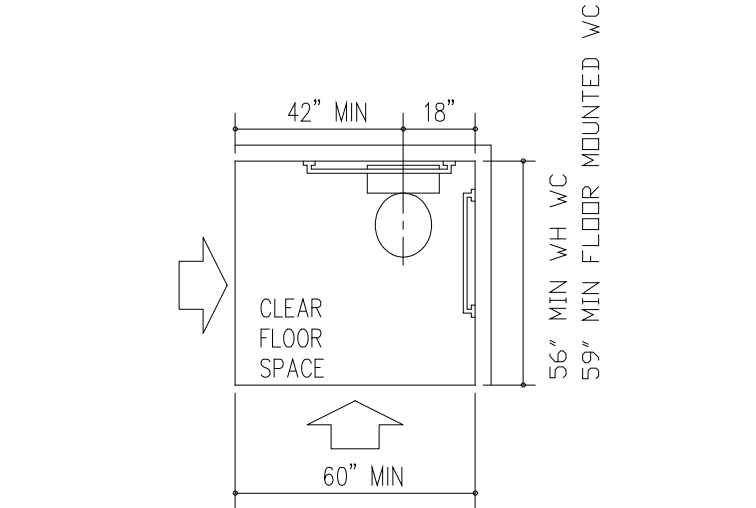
CLEAR FLOOR SPACE AT ACCESIBLE WATER CLOSET
